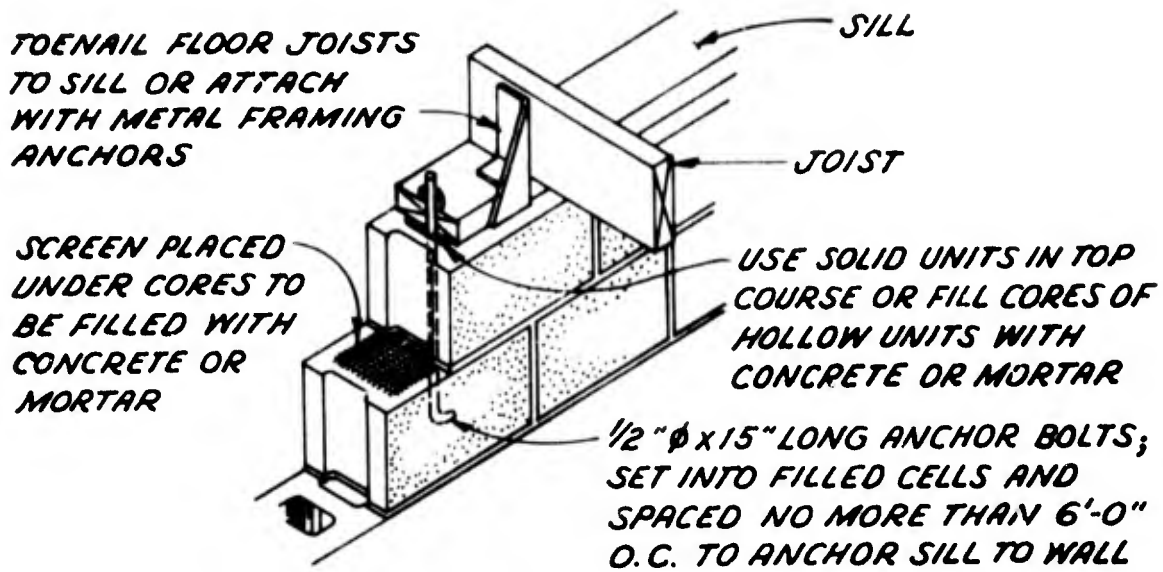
Typical anchorage details for attaching superstructure to concrete block masonry foundation walls.
